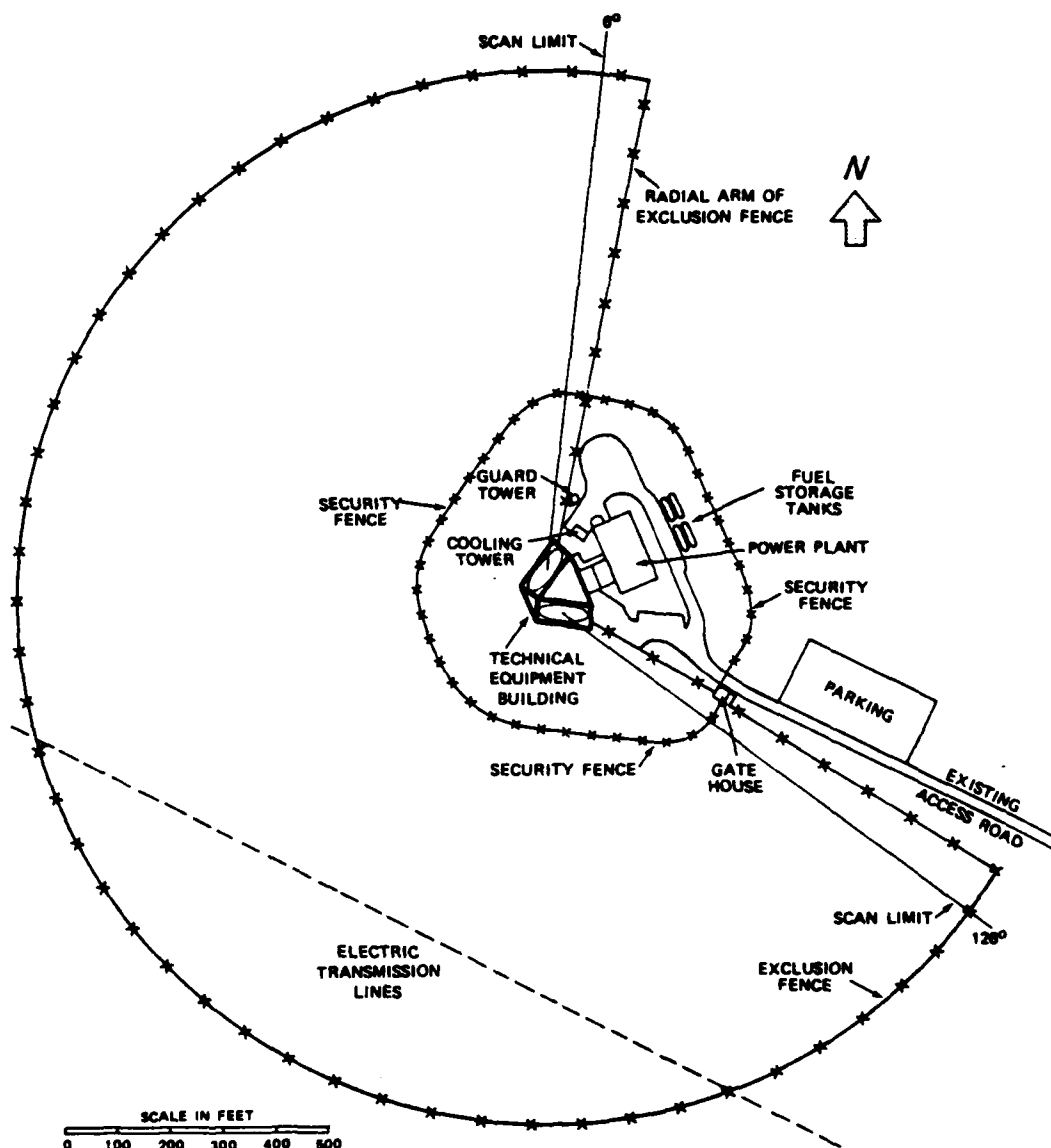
PAVE PAWS SITE PLAN AT BEALE AIR FORCE BASE
